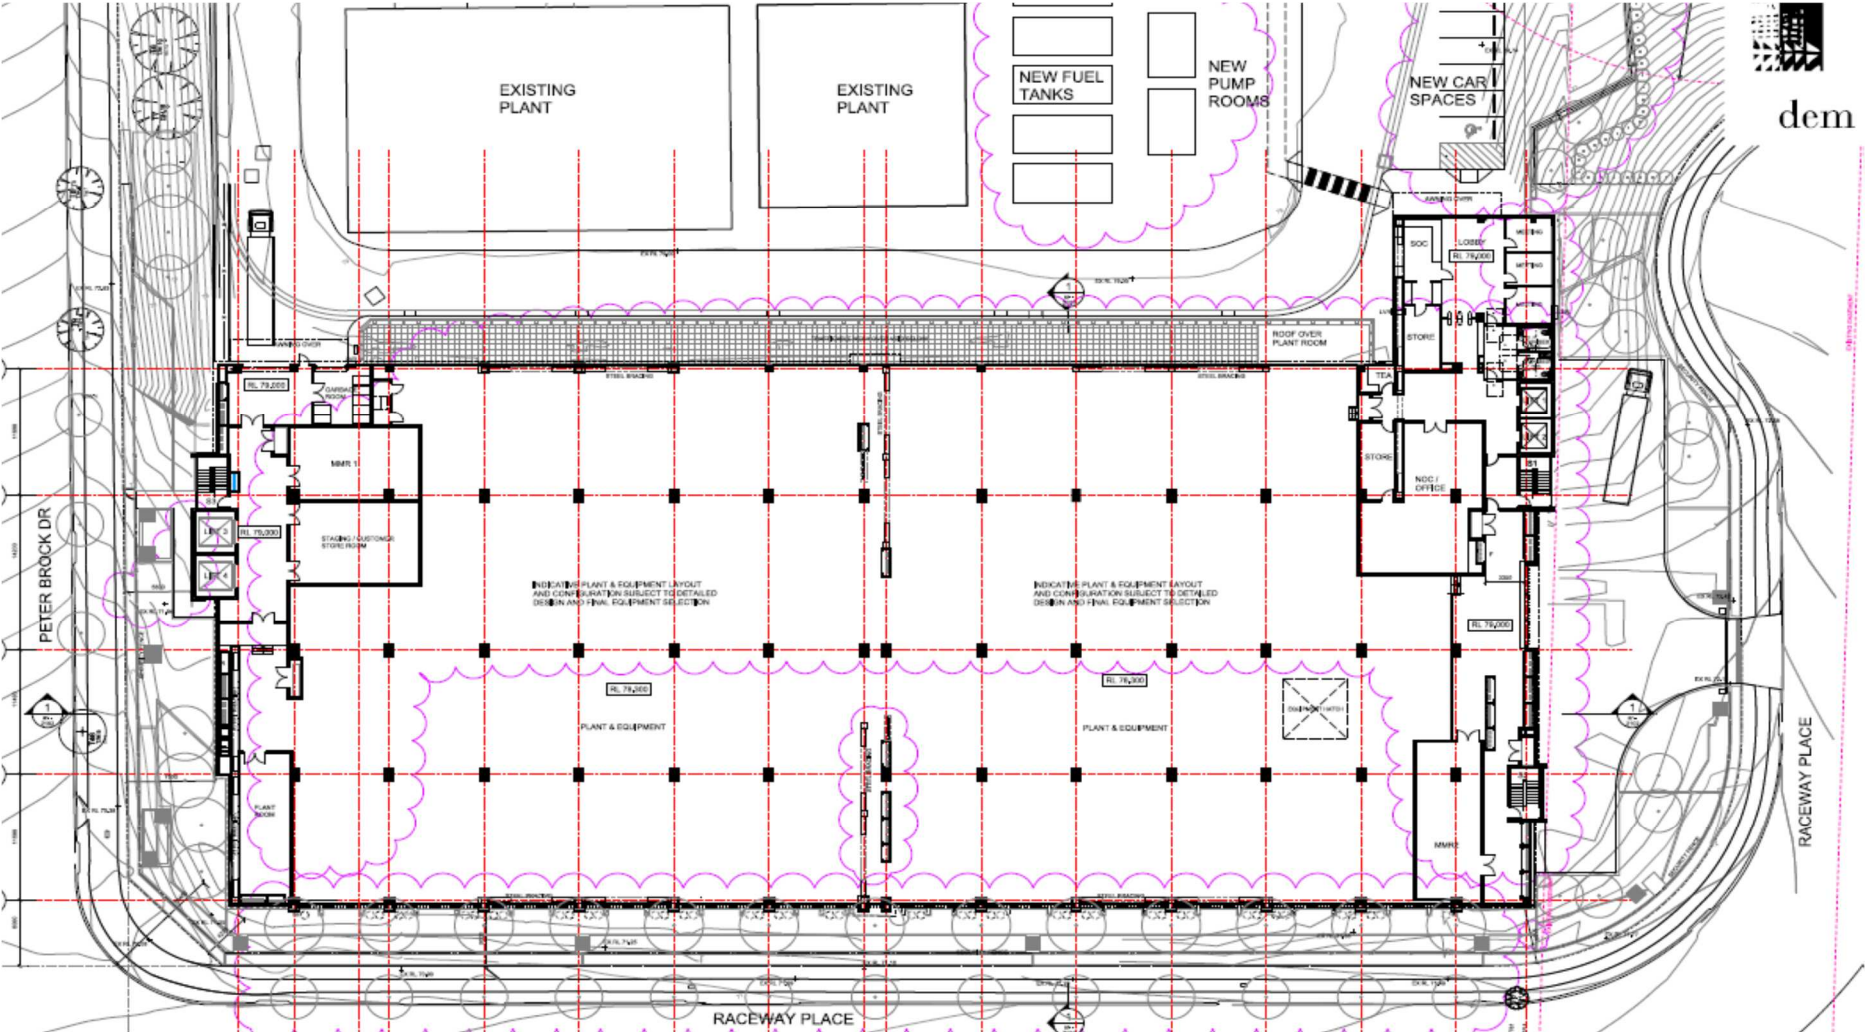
Level One Floor Plan of the DCI SYD02 Data Centre.
